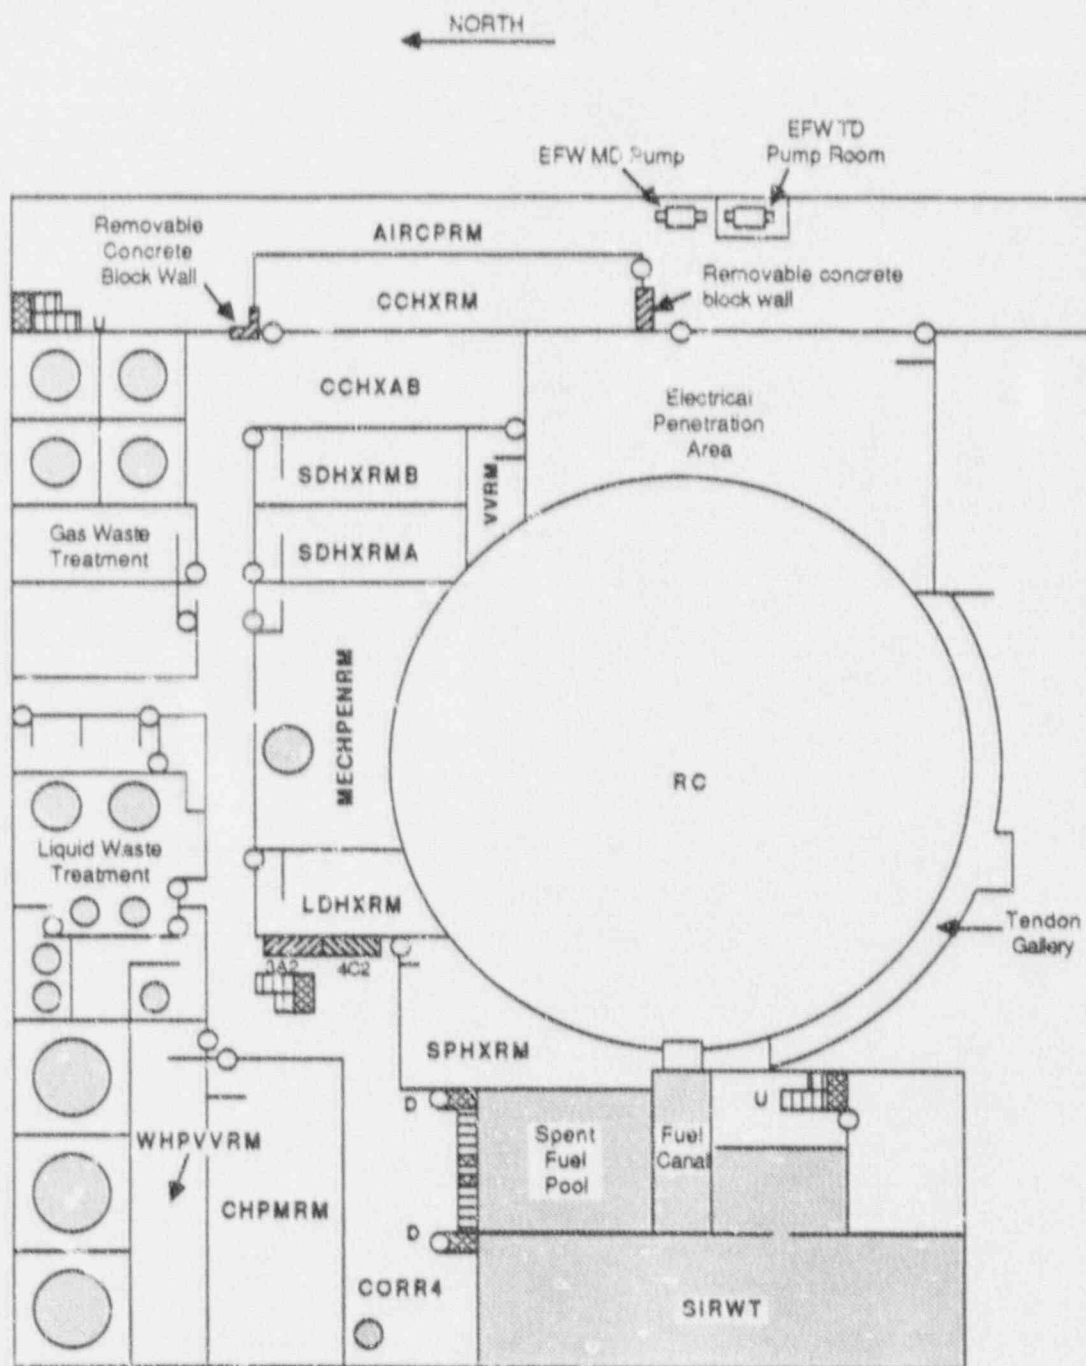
Fort Calhoun Auxiliary Building & Containment Basement (Elevation 989')
